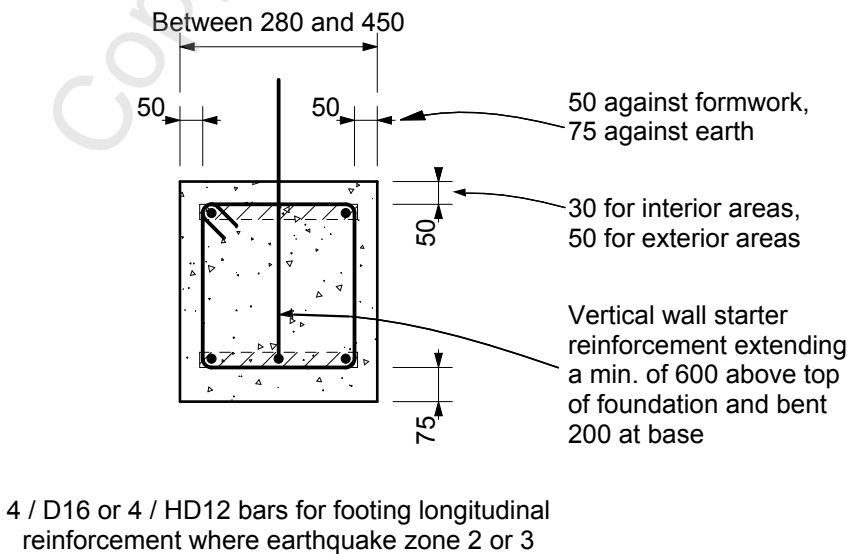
Footing reinforcement in earthquake zone 2 or 3
